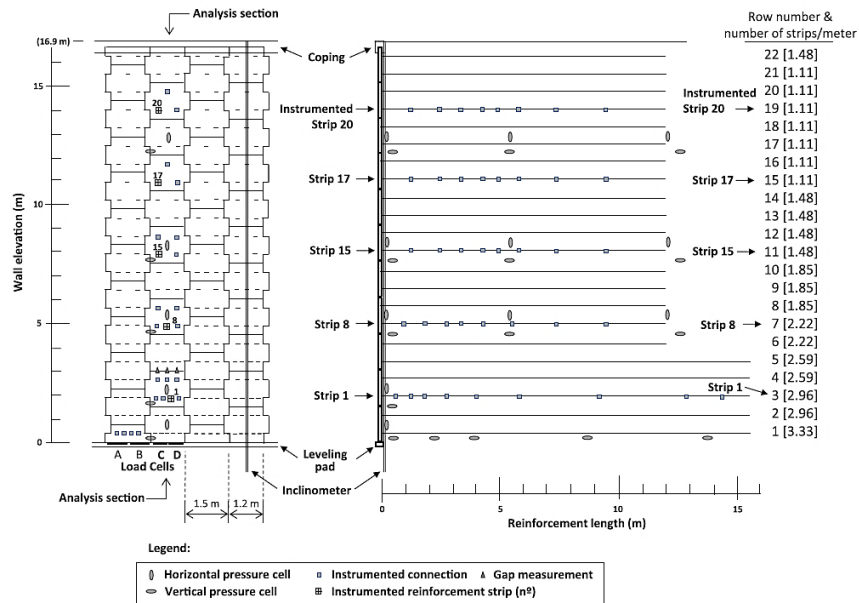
Layout of Retaining Wall and Sensors Under Study (Damians et al., 2015)
